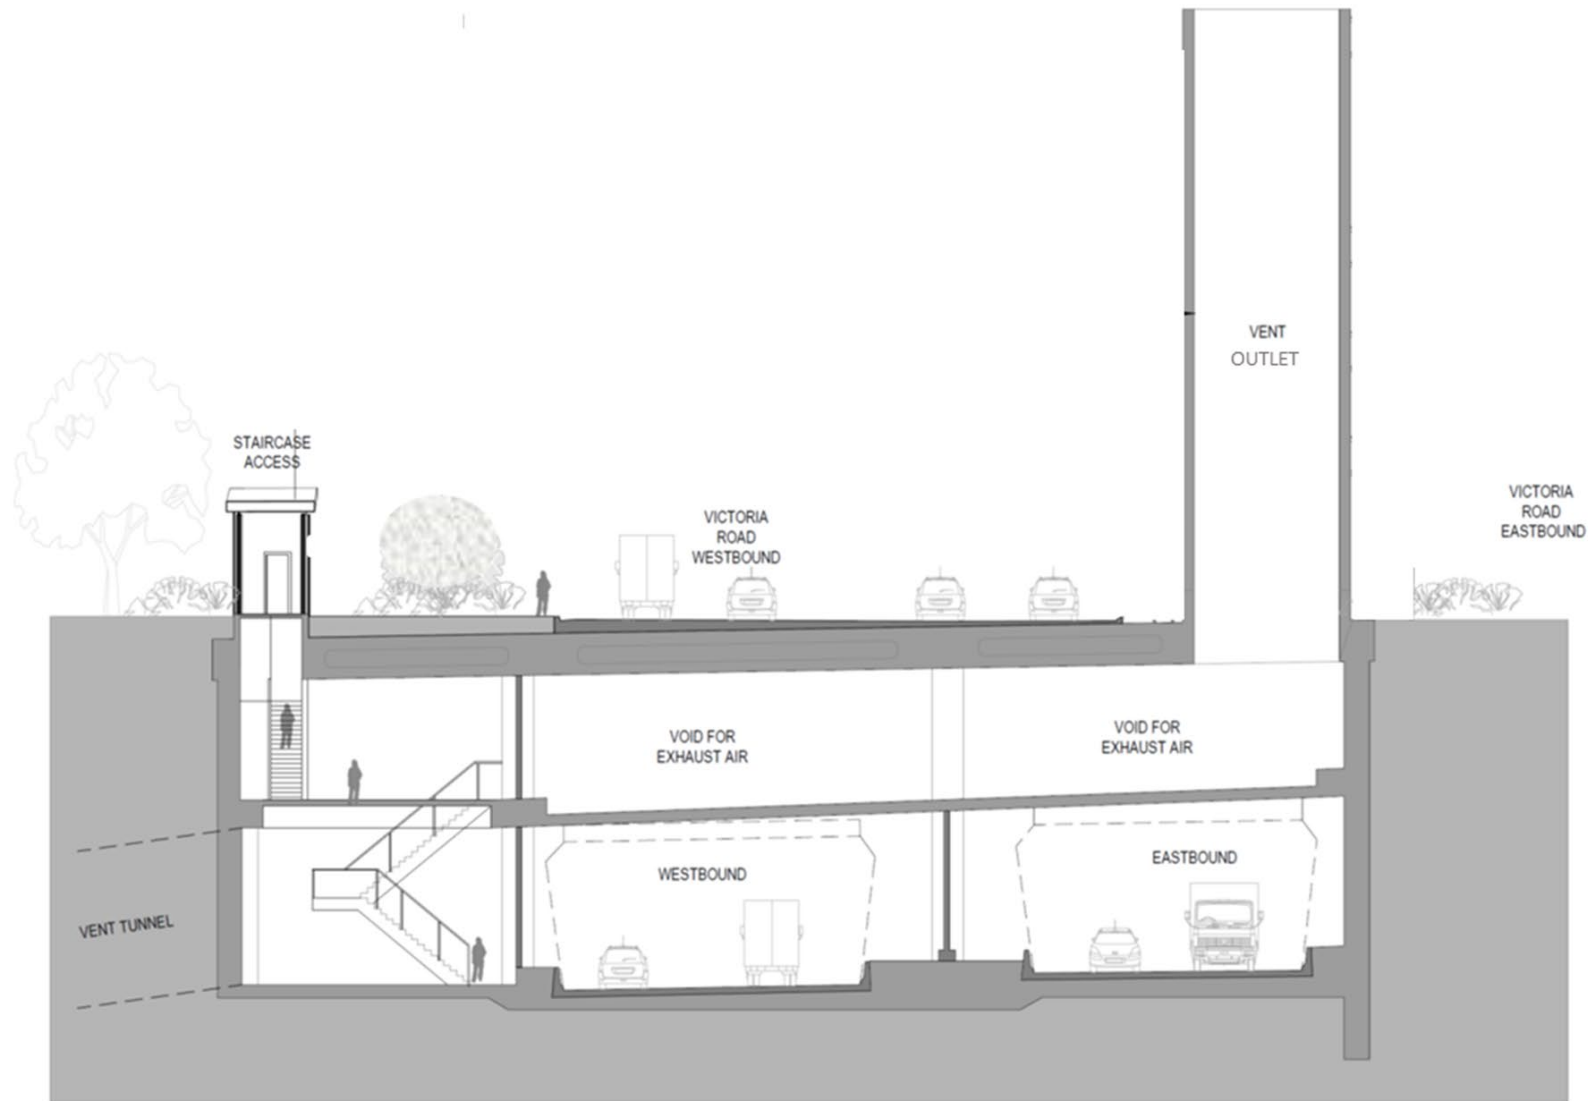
Cross-section showing indicative arrangement of ventilation tunnel connection to ventilation outlet
